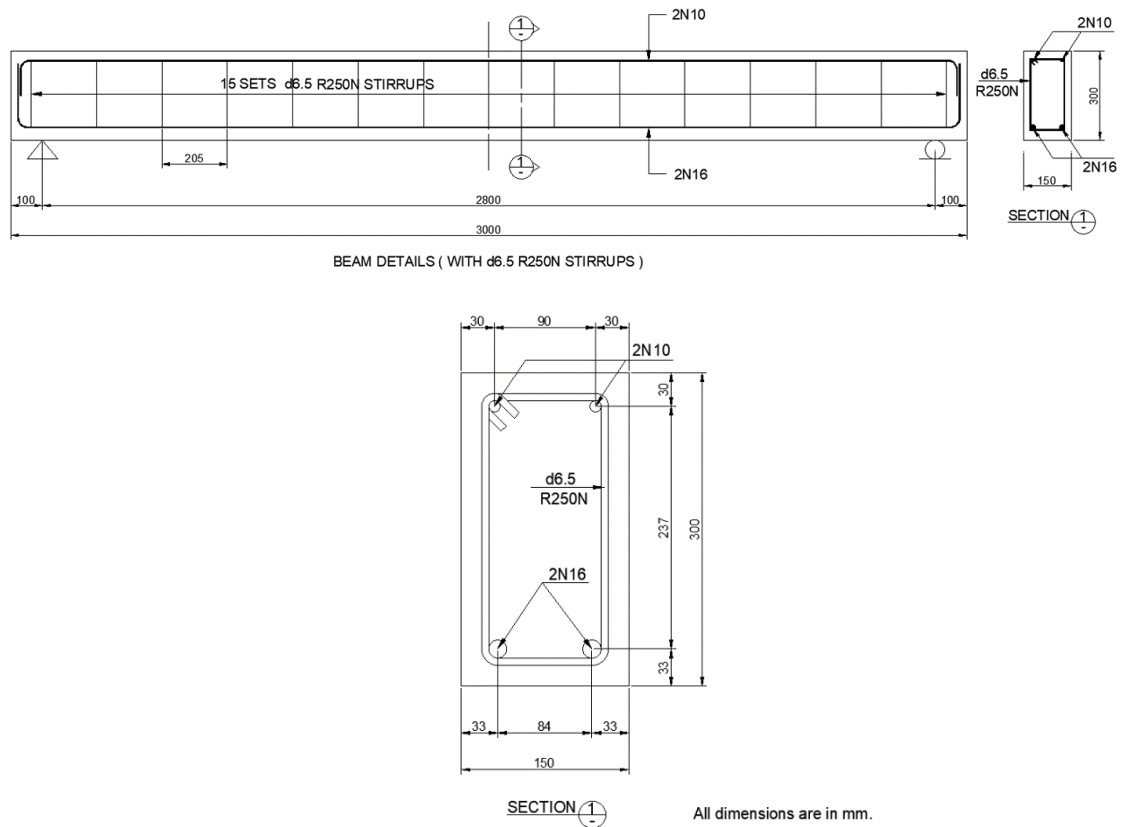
1 Reinforcement details of full-scale 3 m long reinforced concrete beam
